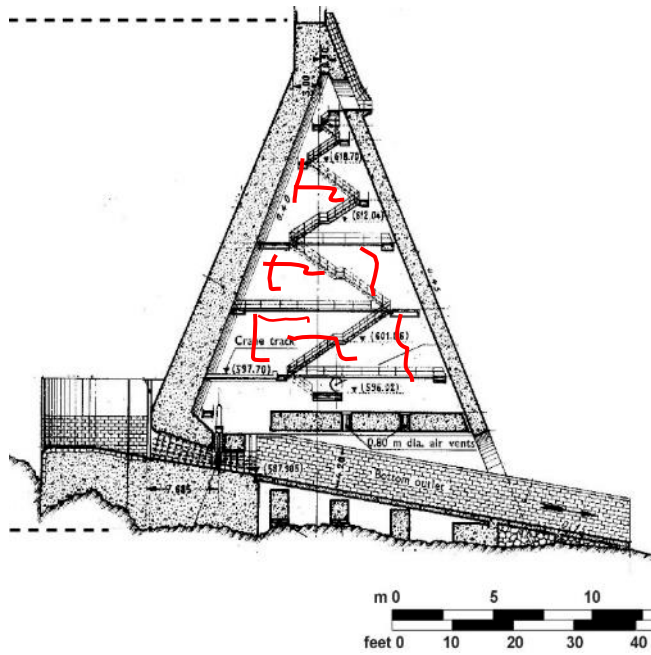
Vertical cross section along the main buttress of a hollow gravity dam and the structural cracks inside the dam cavity
